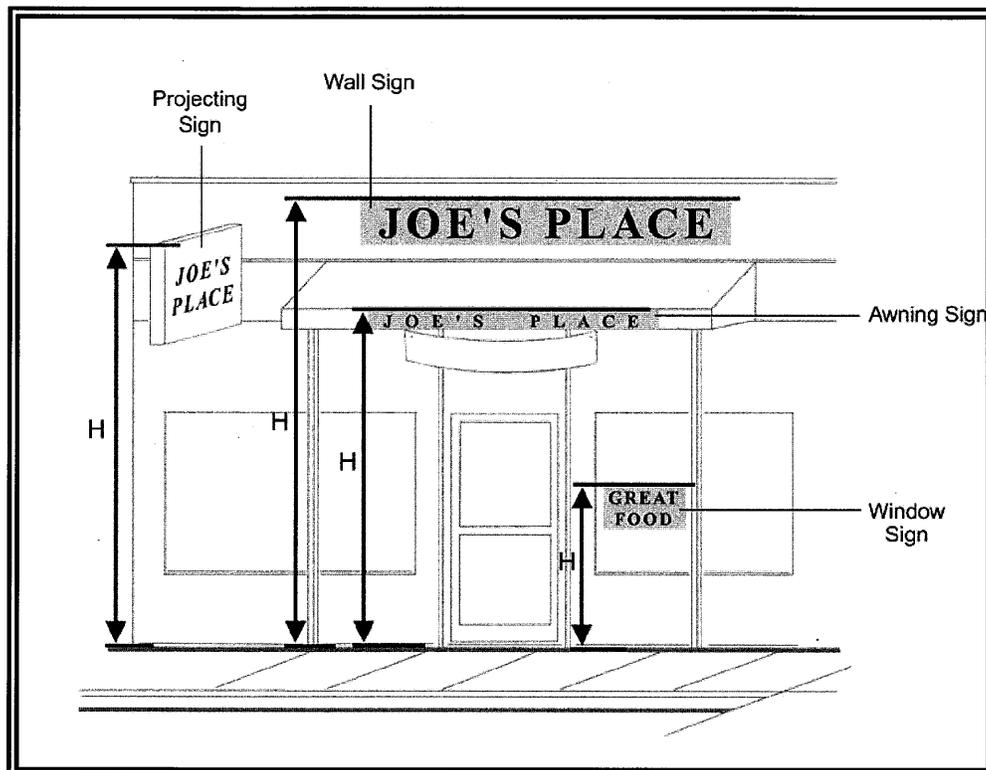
Window, Awning, Projecting and Wall Sign Height Measurements
